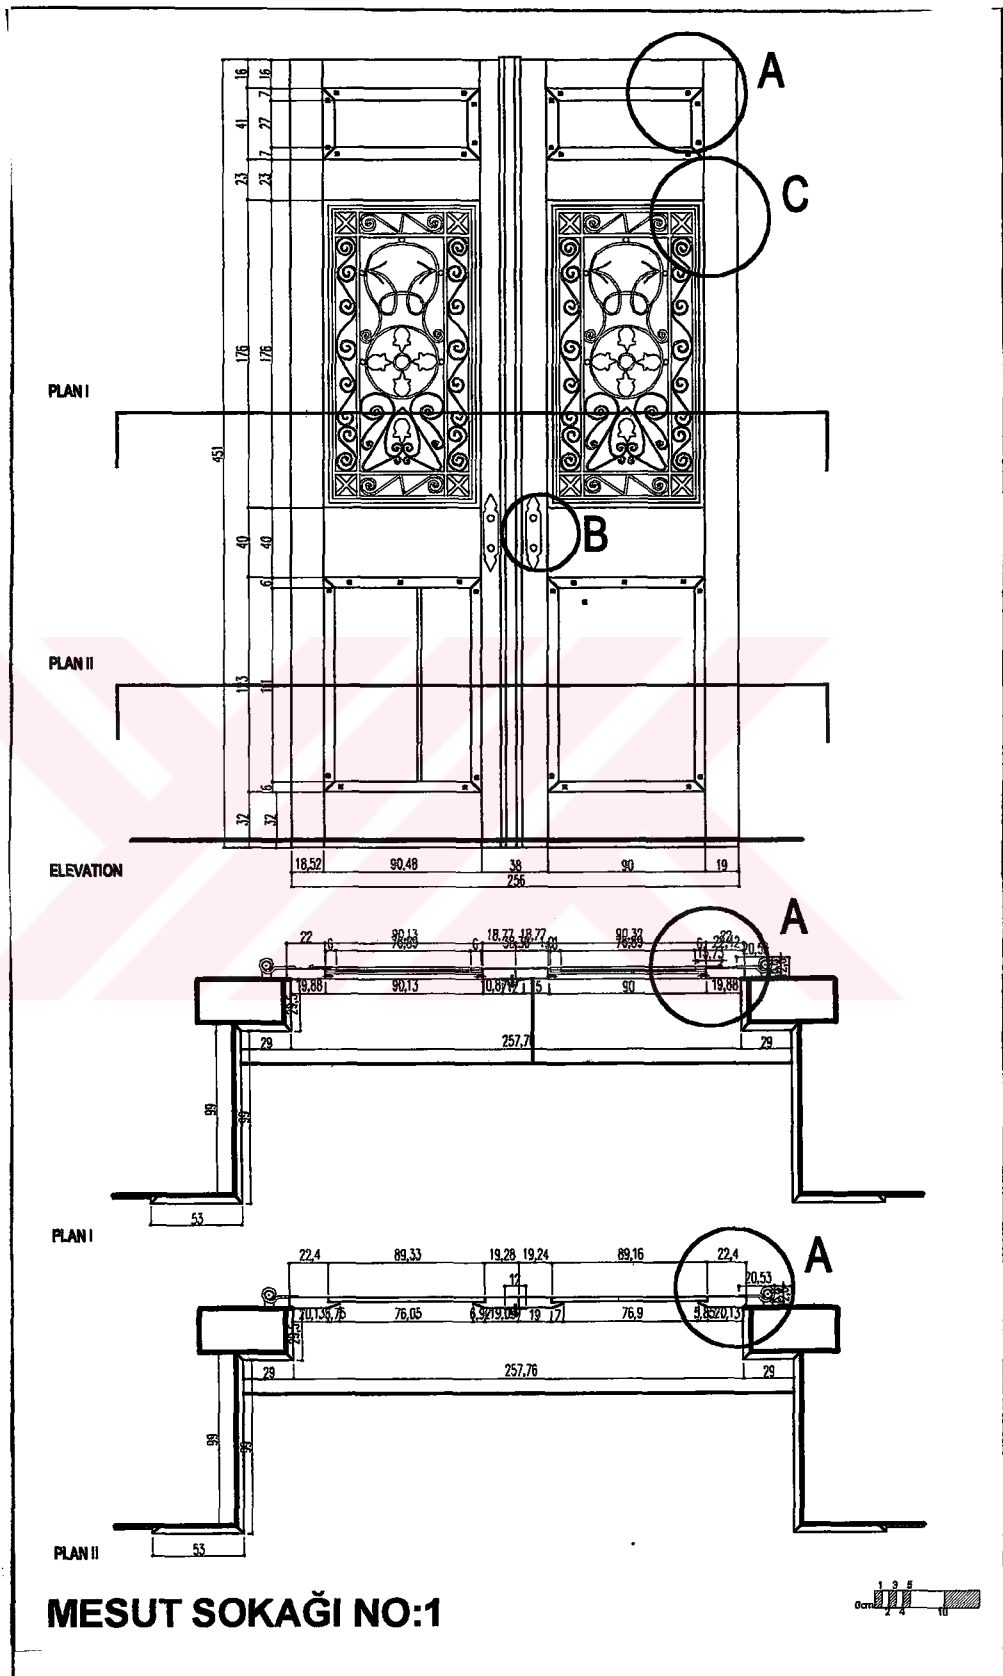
DW04A Mesut Sokağı No:1 – Exterior Elevation and Plans
